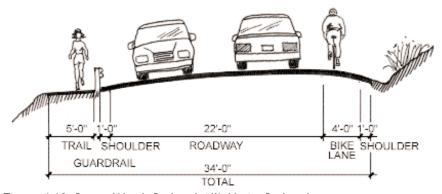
Proposed Lincoln Boulevard at Washington Boulevard
